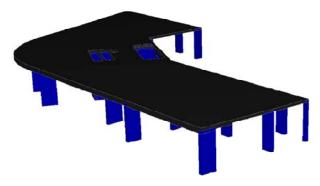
Typical Floor Perspective Modeled in RAM Concept
